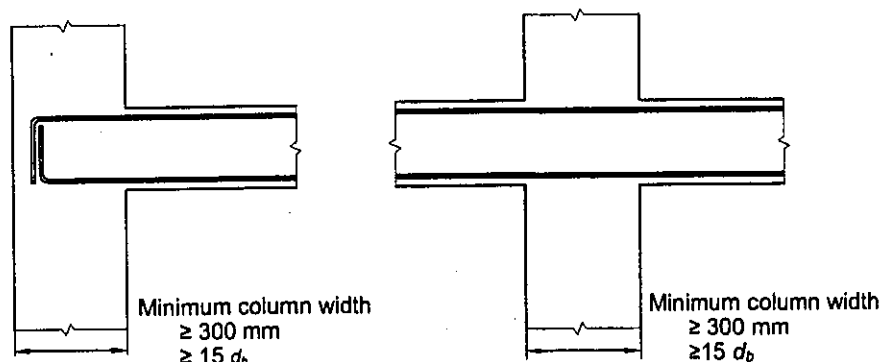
MINIMUM SIZE OF RC COLUMNS BASED ON DIAMETER OF LARGEST LONGITUDINAL REINFORCEMENT BAR IN BEAMS FRAMING INTO IT
